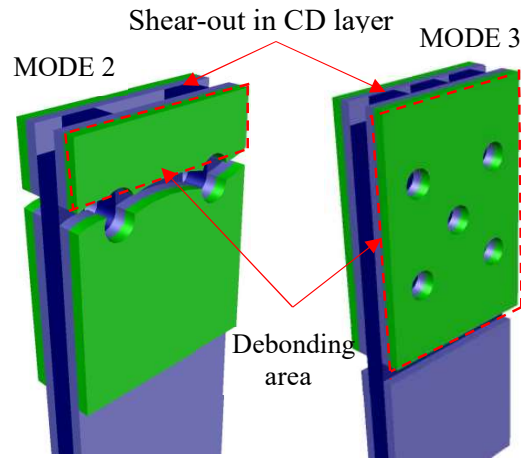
Failure modes in strengthened specimens and the debonding area.
